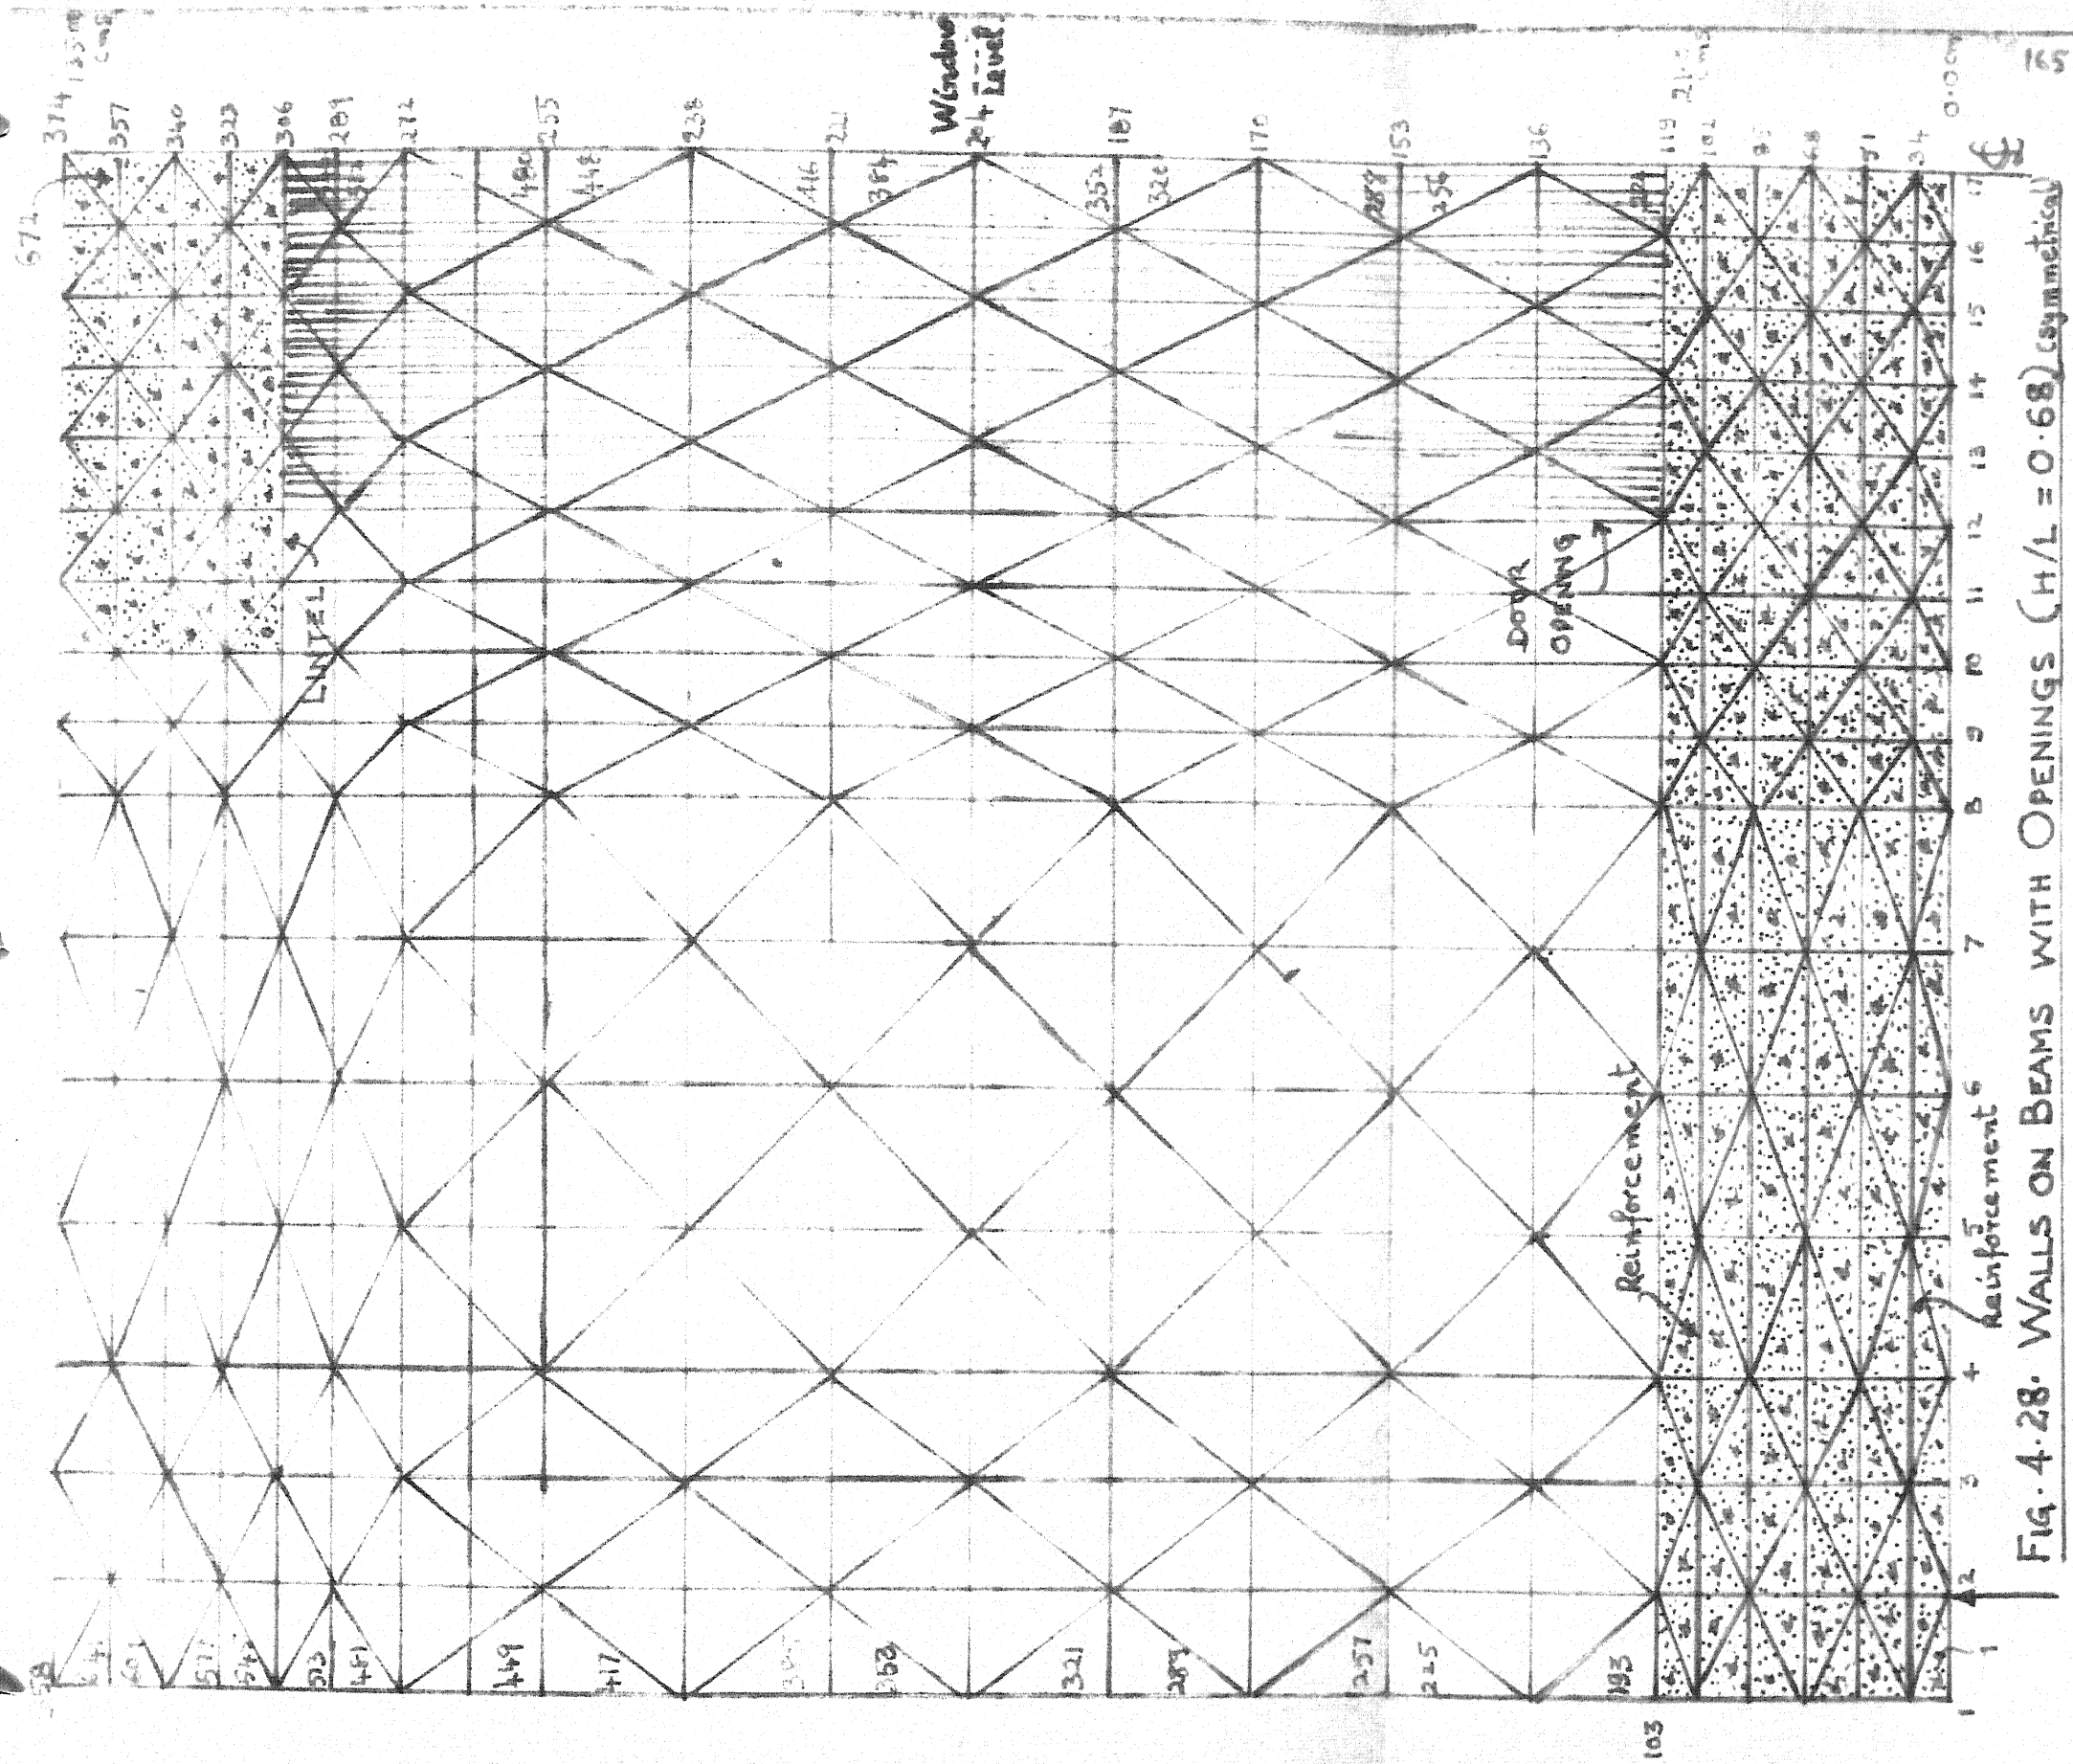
WALLS ON BEAMS WITH OPENINGS ($H/L = 0.68$) (symmetrical)
